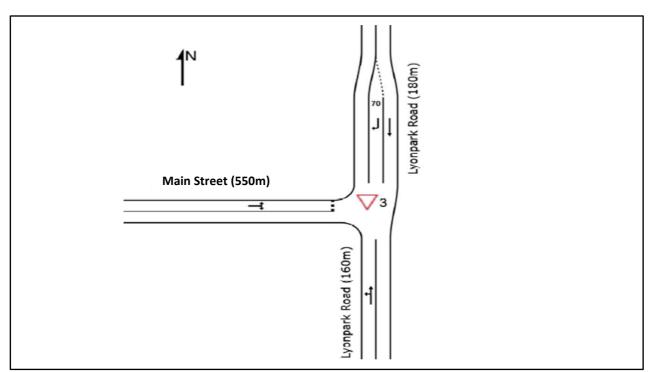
Main Street / Lyonpark Road SIDRA Intersection Layout
